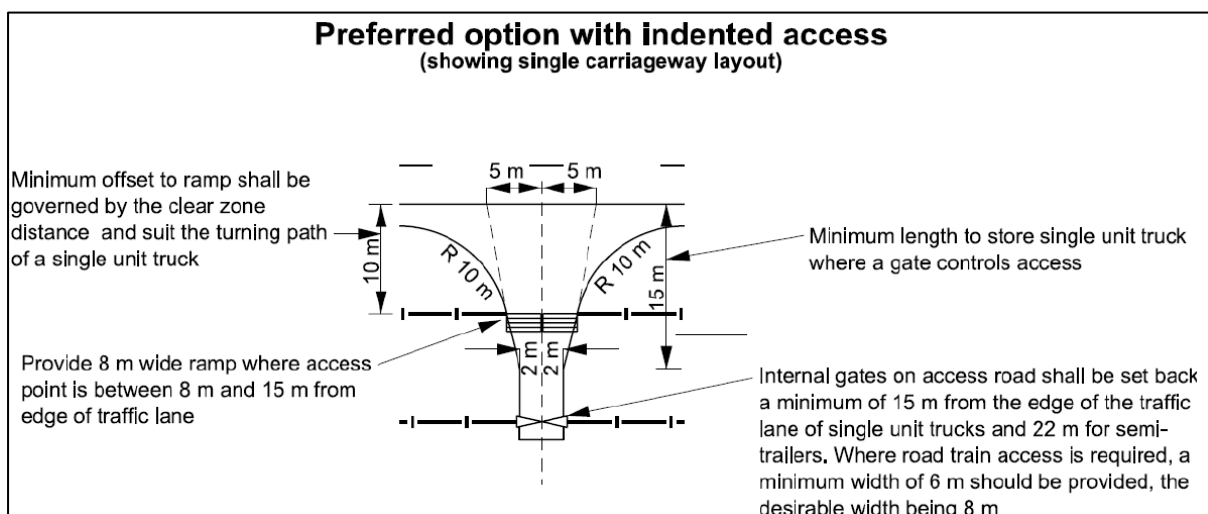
Typical Rural Intersection to allow trucks to exit or enter the site with the gate closed.
